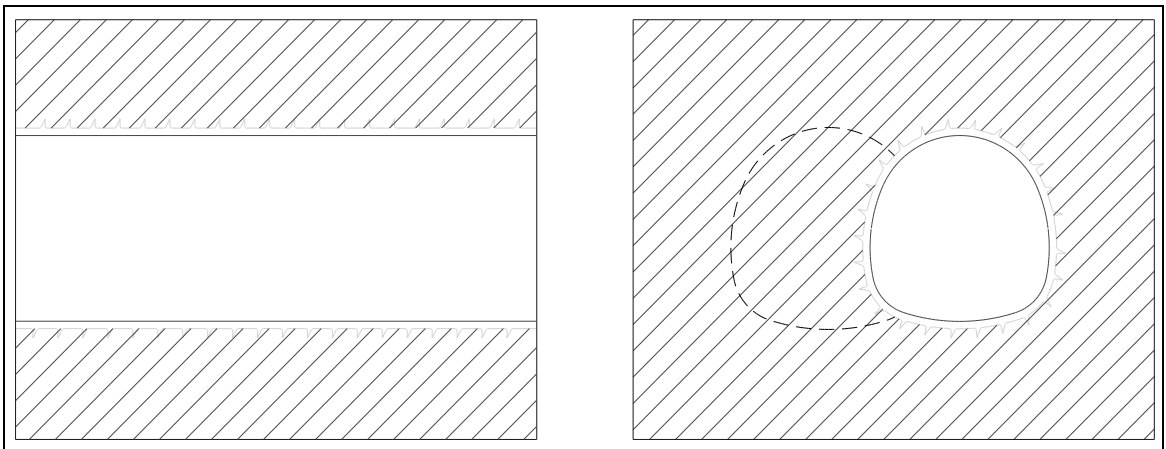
Stage 8 – OB Tunnel B/I Excavated and Shotcrete Lining Installed
